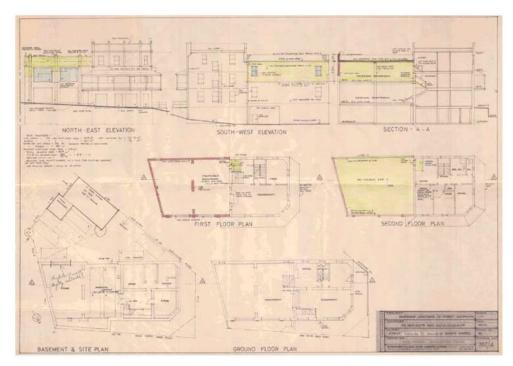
Plans submitted for the construction of an additional level above the eastern showroom (86/30). This scheme was not approved.
